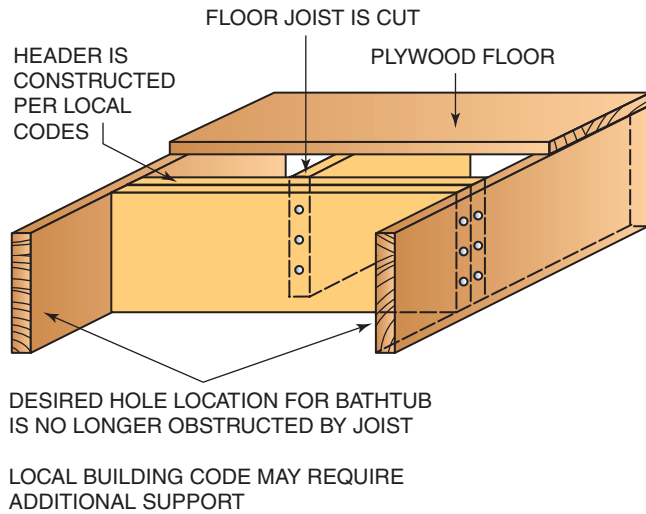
A carpenter can cut a floor joist and install a header per local code to provide an opening for a tub drain location.
